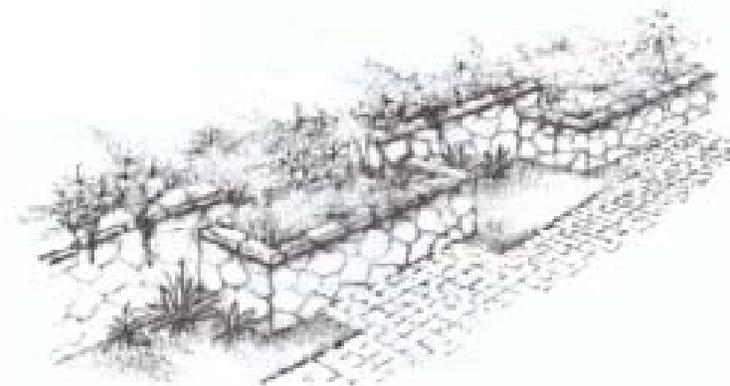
Undulated retaining walls provide an opportunity to add plantings, both in front of the wall and within planters
